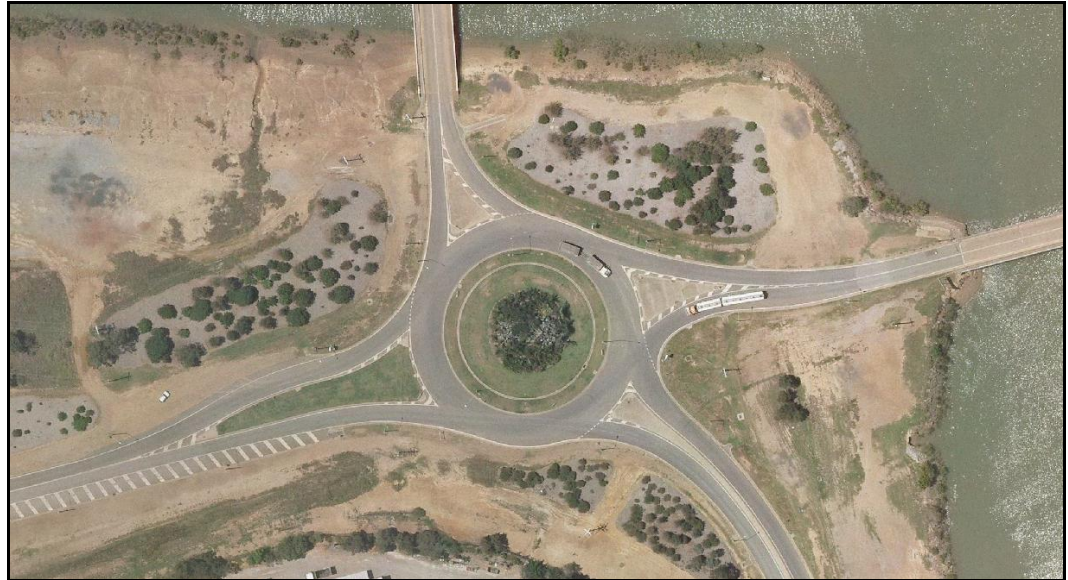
Hanson Road/ Blain Drive/ Alf O'Rourke Drive – Existing Layout
